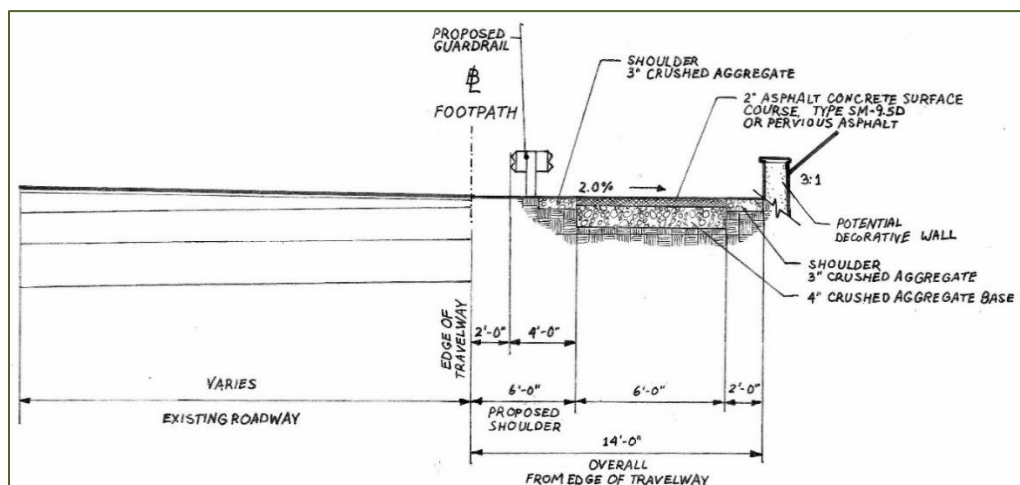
Possible Typical Section for Footpath with Retaining Wall for Cut Slope
